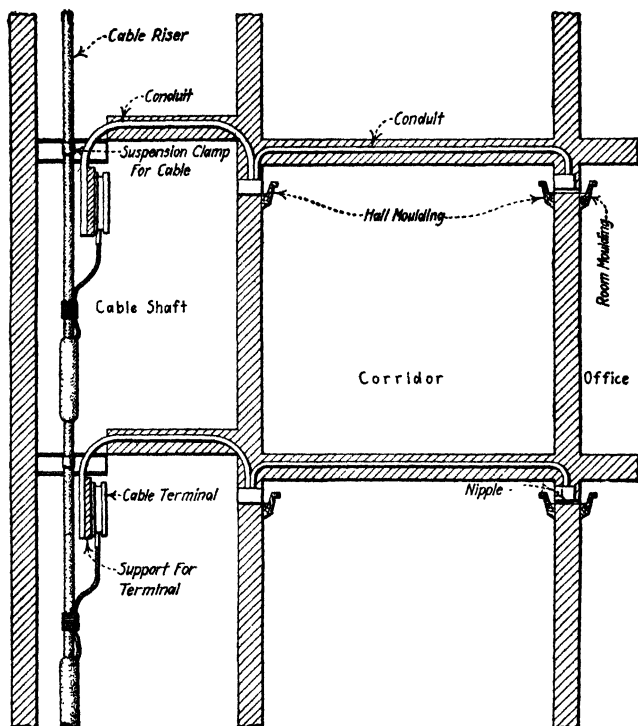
Section through cable shaft, corridor, and offices of an office building showing conduit-wiring details.
